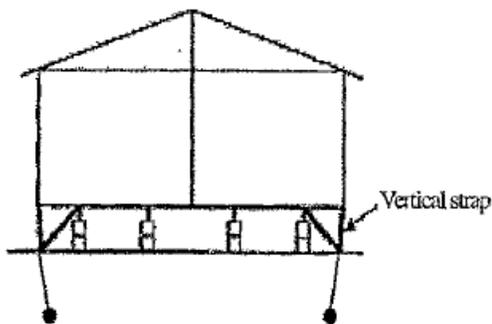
Anchor Strap and Pier Relationship.
